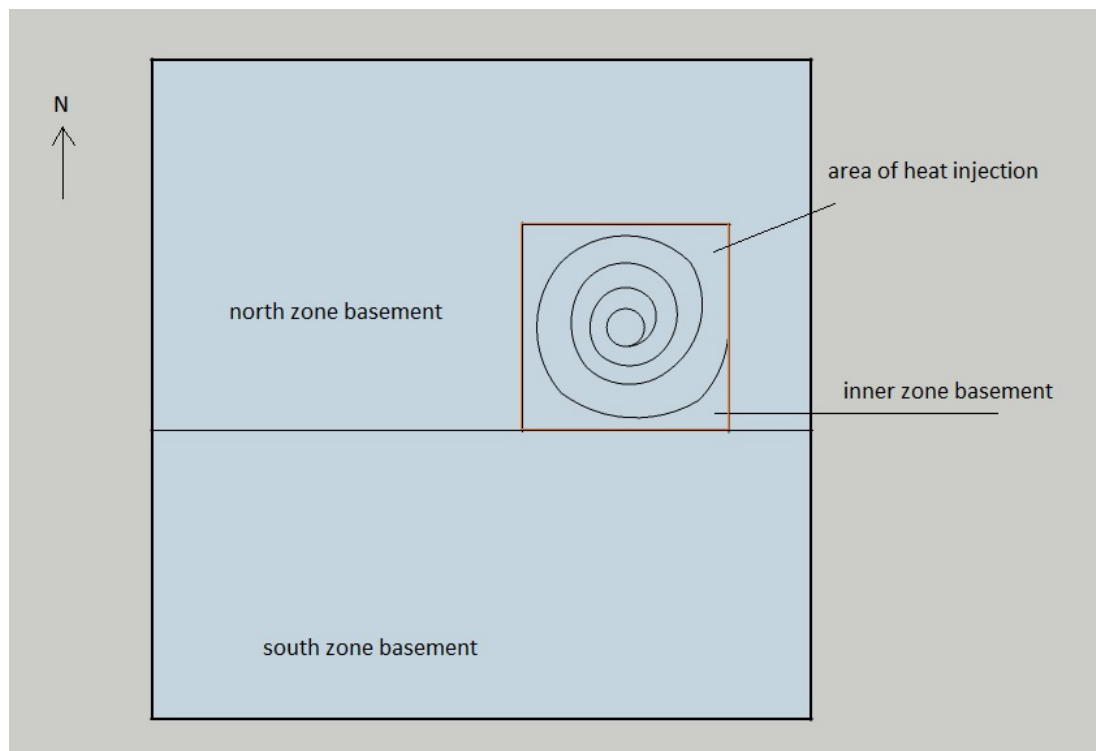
Alternative 1: Heat injection in the inner basement floor
